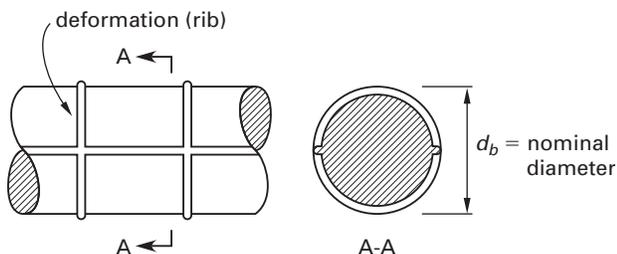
Elevation and Cross Section of Typical Reinforcing Bar
